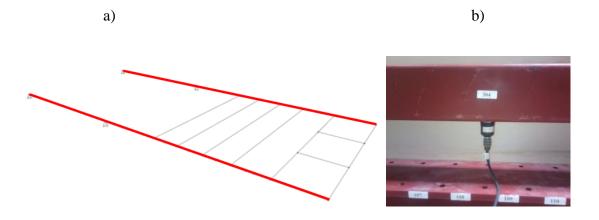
a) Location of accelerometers along HSS beams. b) Connection of accelerometer to HSS beam.
